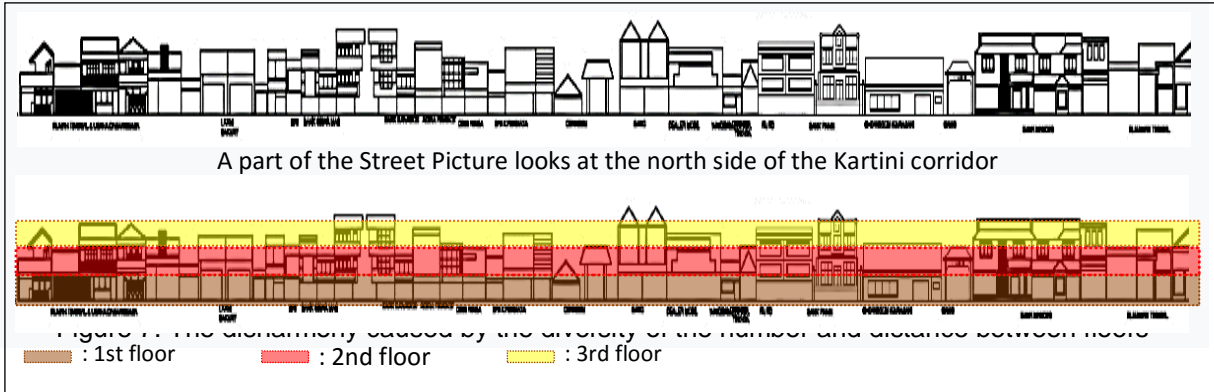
explains the disharmony of the number and distance between floors in a row of buildings in the north side of Kartini Street corridor. The distance between the first floor is not the same, as well as from the 2nd floor to the 3rd floor. Listplang which marks the 2nd floor and the 3rd floor does not have the same height from the ground and result in a broken line and gives the display that is not a unity.
